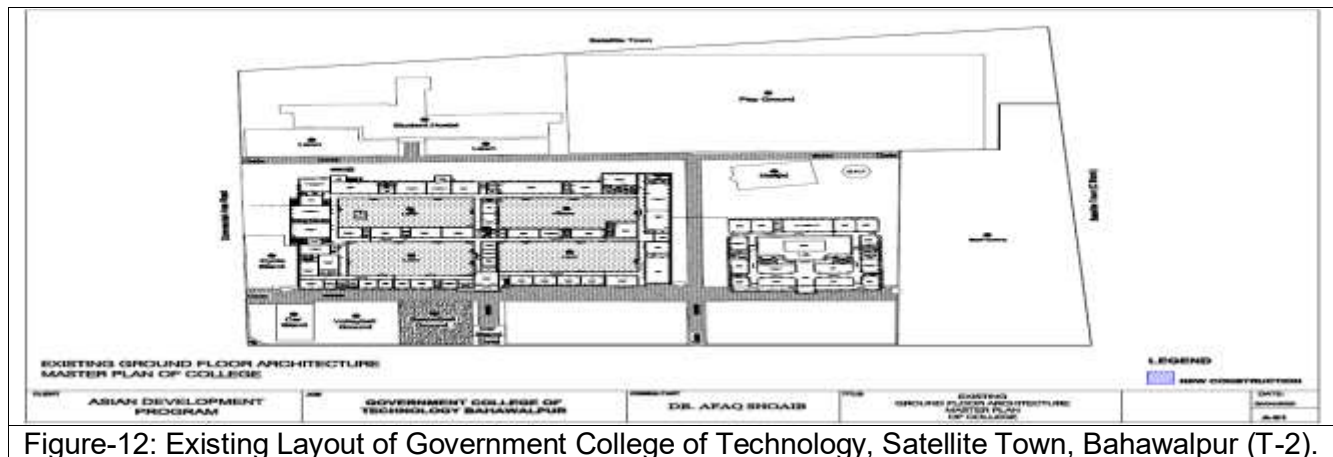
Existing Layout of Government College of Technology, Satellite Town, Bahawalpur (T-2).
